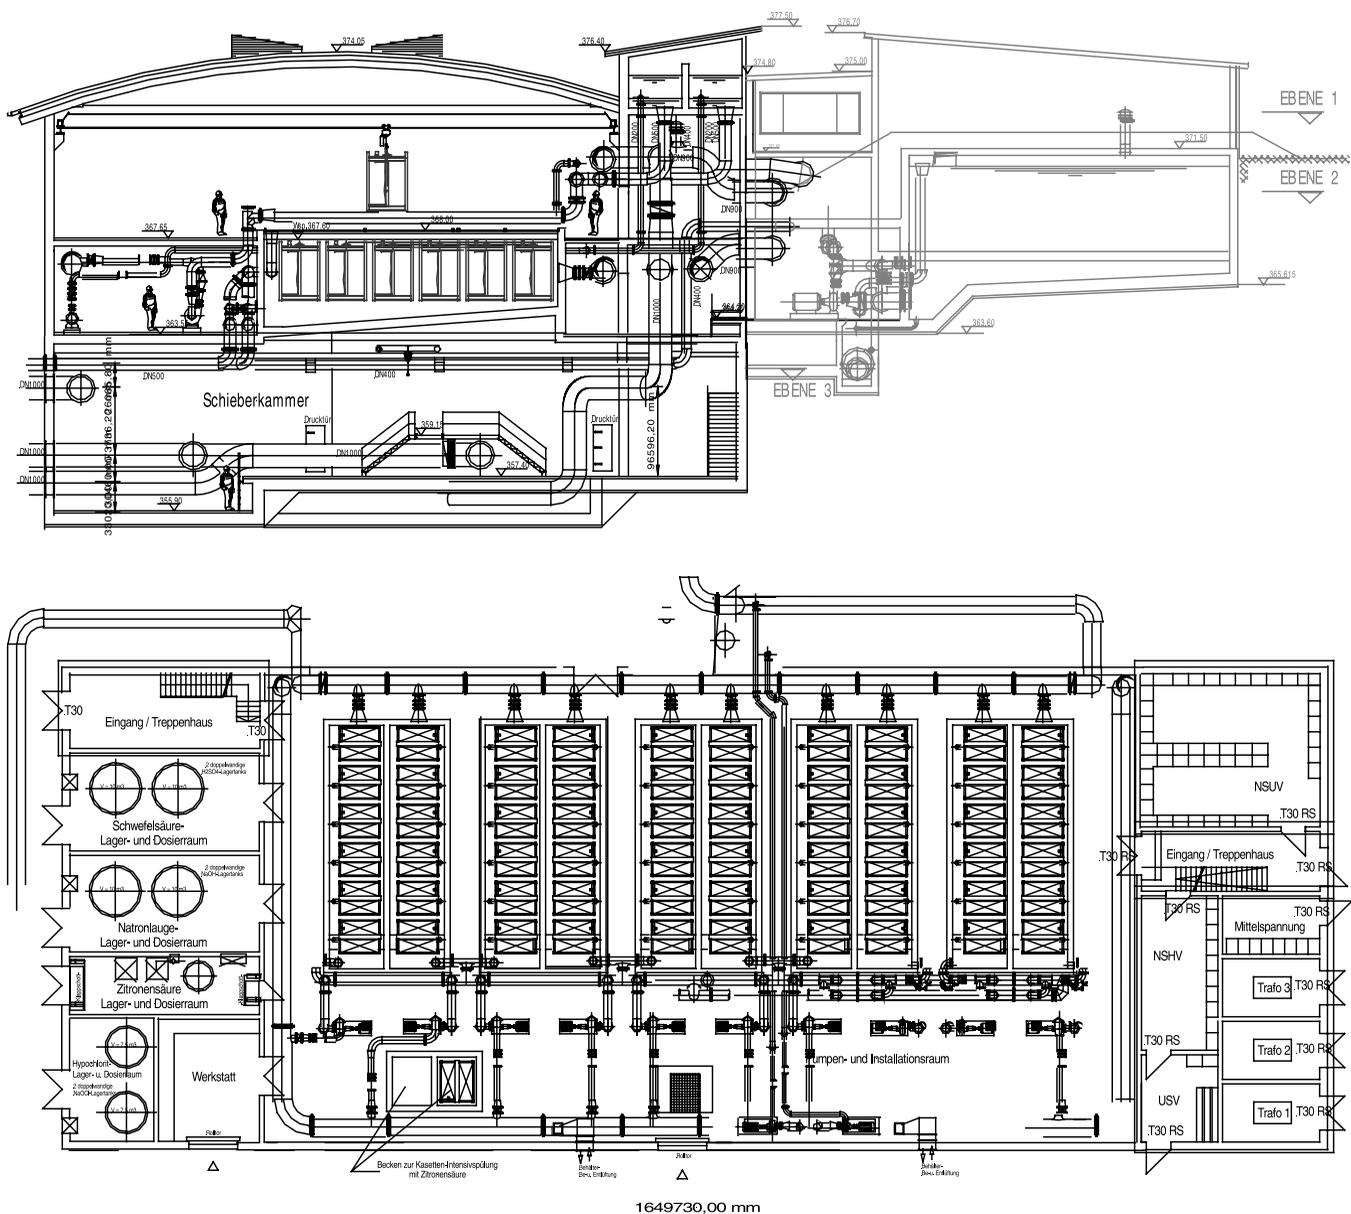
| Ground sketch and sectional view of the new part of the building showing the suction membrane variant above the new drinking water storage facility.
